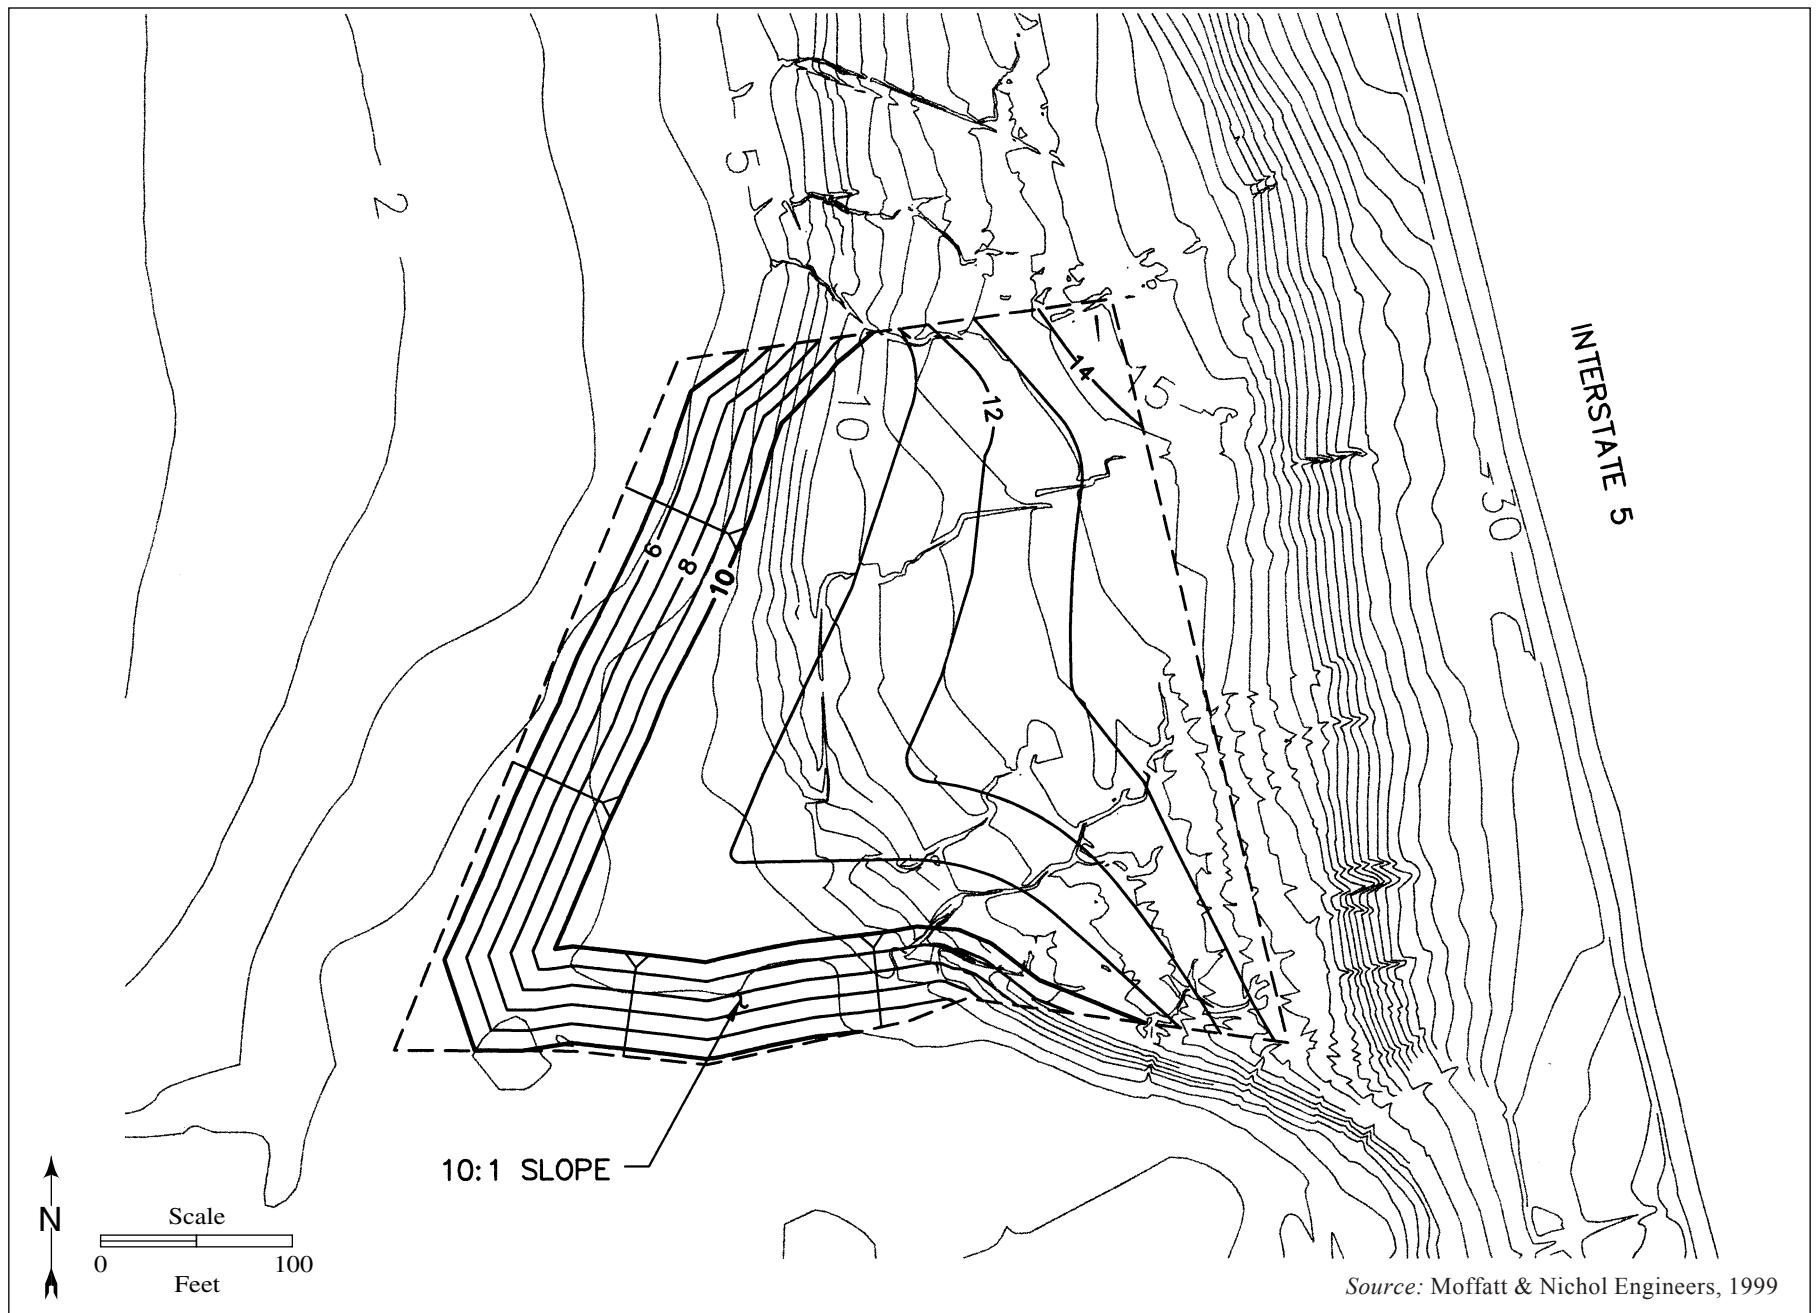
Nesting Site NS15 Grading Plan
